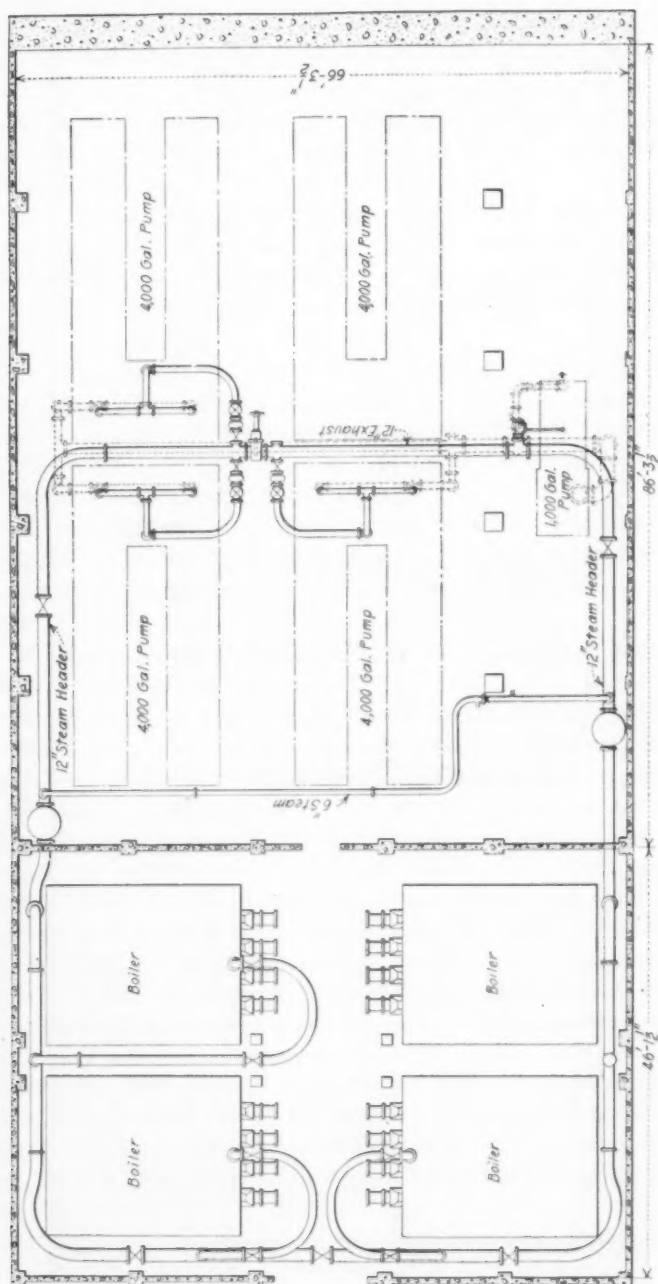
PLAN OF STATION, SHOWING STEAM PIPING
